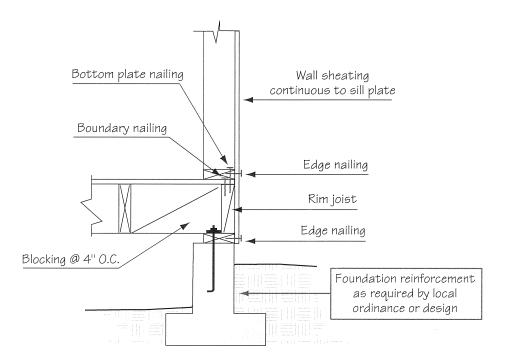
DETAIL K ~ SECT. B-B ~ ELEVATION OF THROUGH-FLOOR SHEAR TRANSFER; SOLID-SAWN FRAMING
